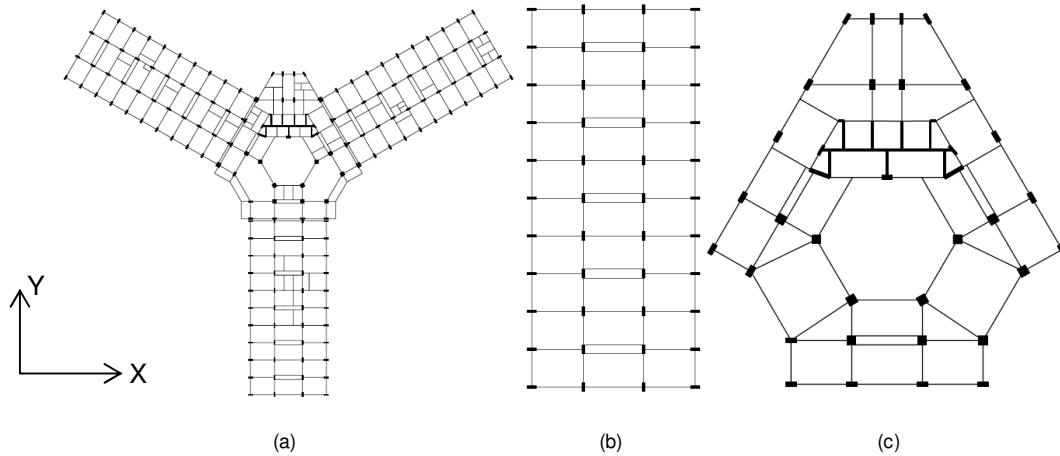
Sketch of a typical floor framing plan (a) integrated building (b) wing (c) central core.
